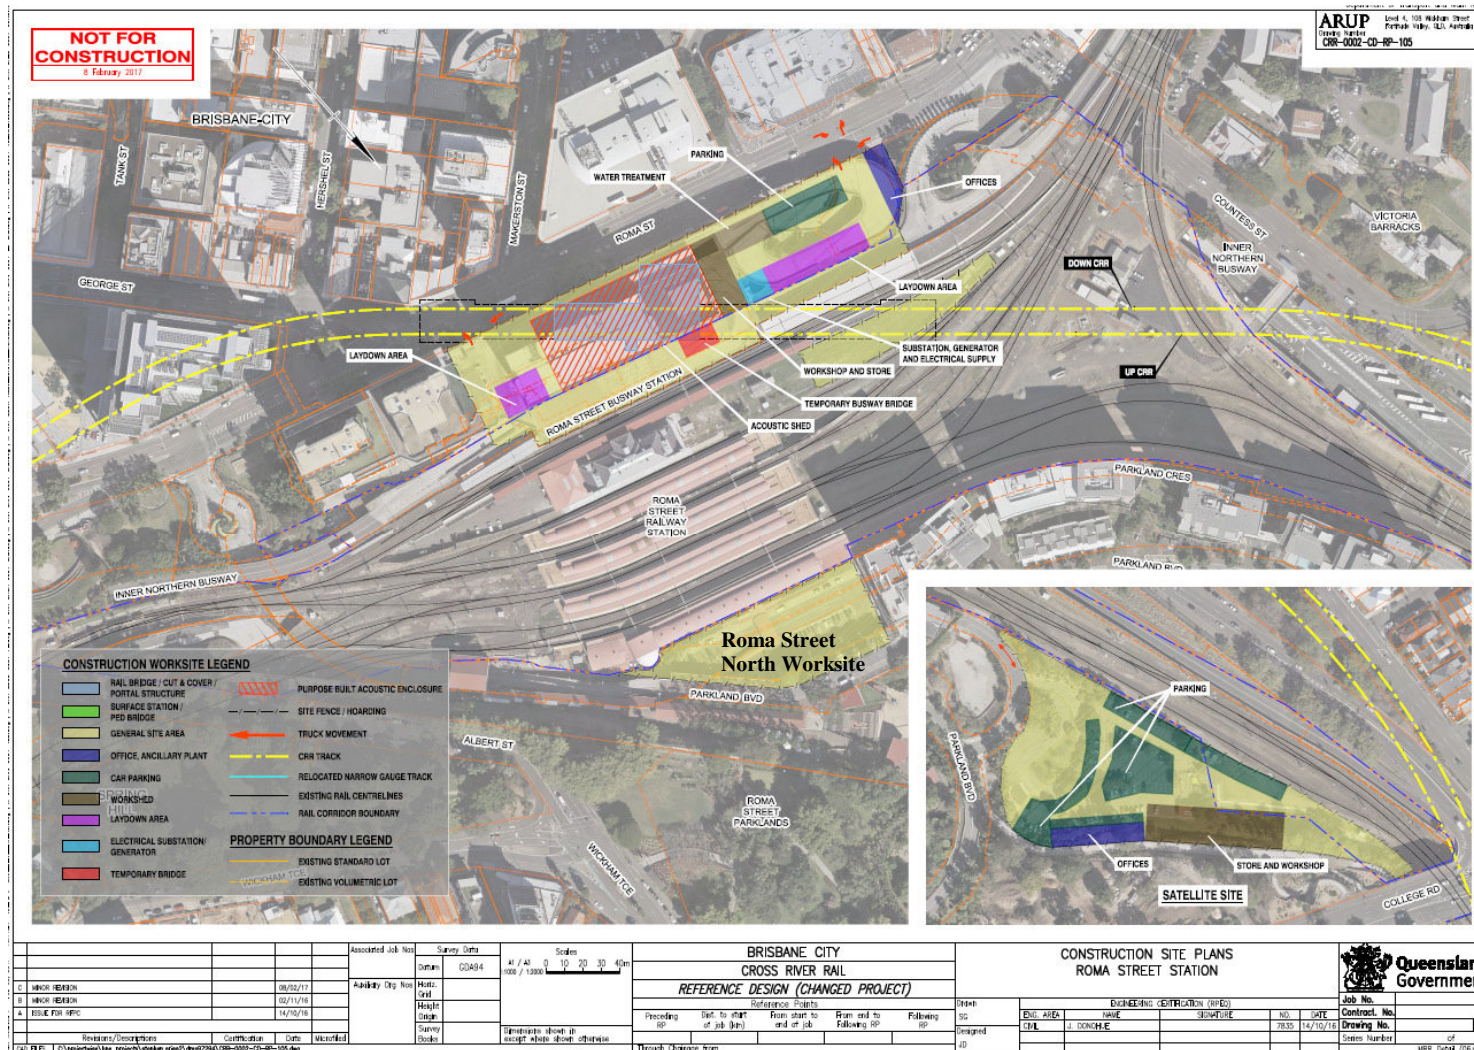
2017 RFPC construction site – Roma Street North Worksite
